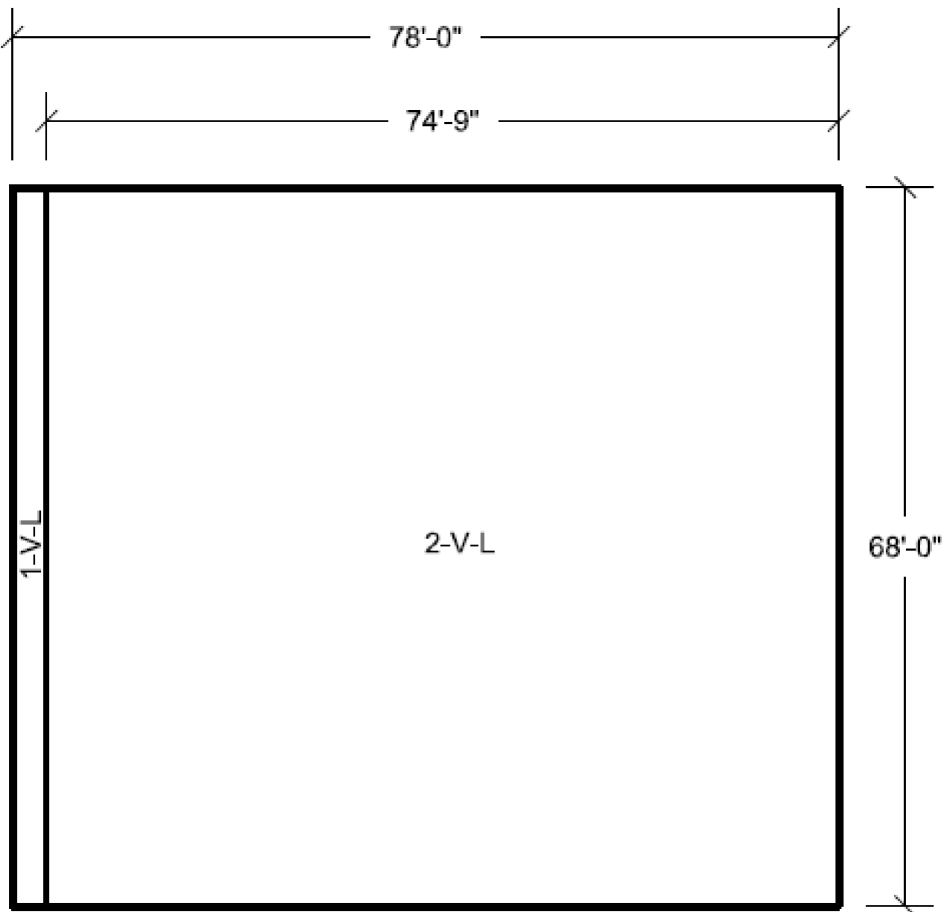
H.6-74 Pump House Internal East Wall Looking West Vertical Reinforcement Zones Far Side Face
